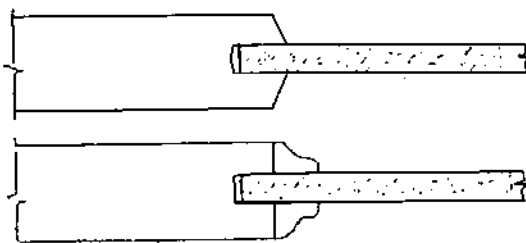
C : Common Methods of Joining Panel with Stiles and Rails with/without Beading
